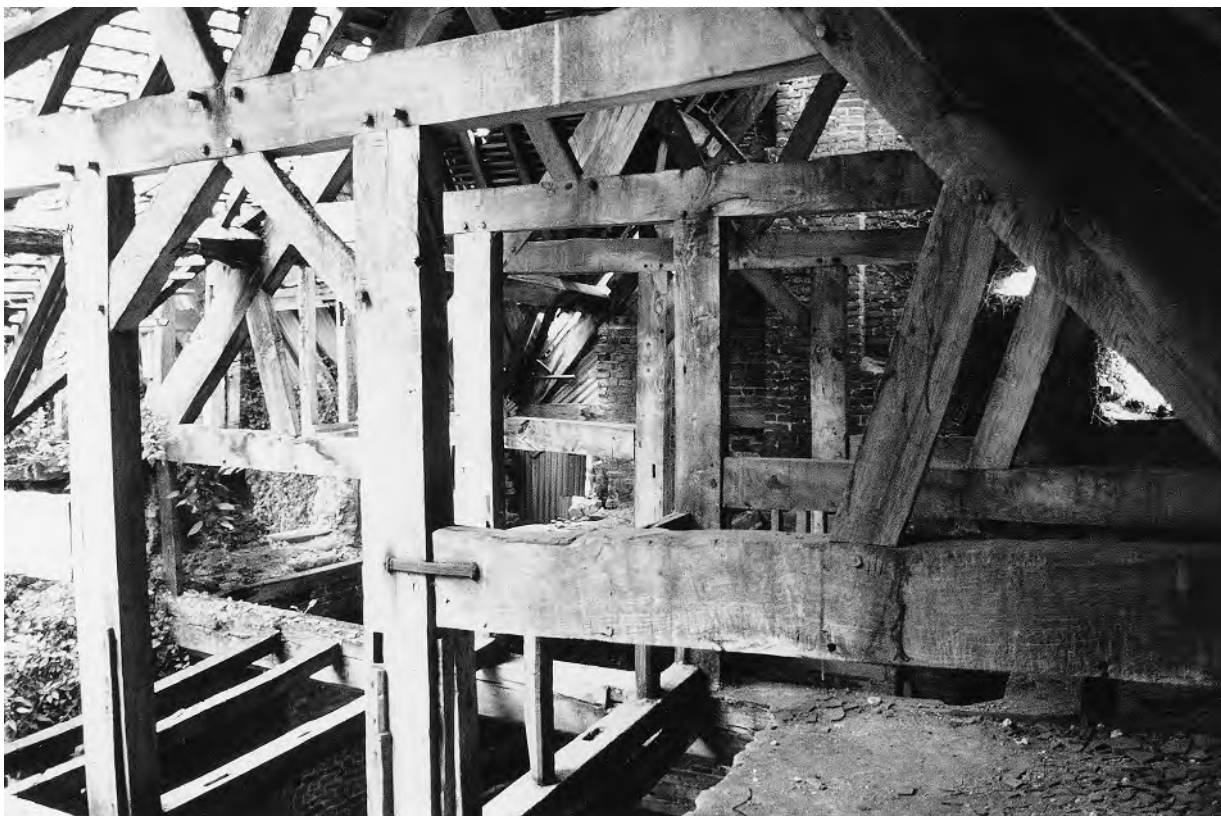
Plate X Madeley Court barn: part of roof frame of north wing looking west prior to collapse (Bob Meeson).
